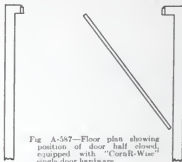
Floor plan showing position of door half closed, equipped with "Corn-R-Wise" single door hardware.
